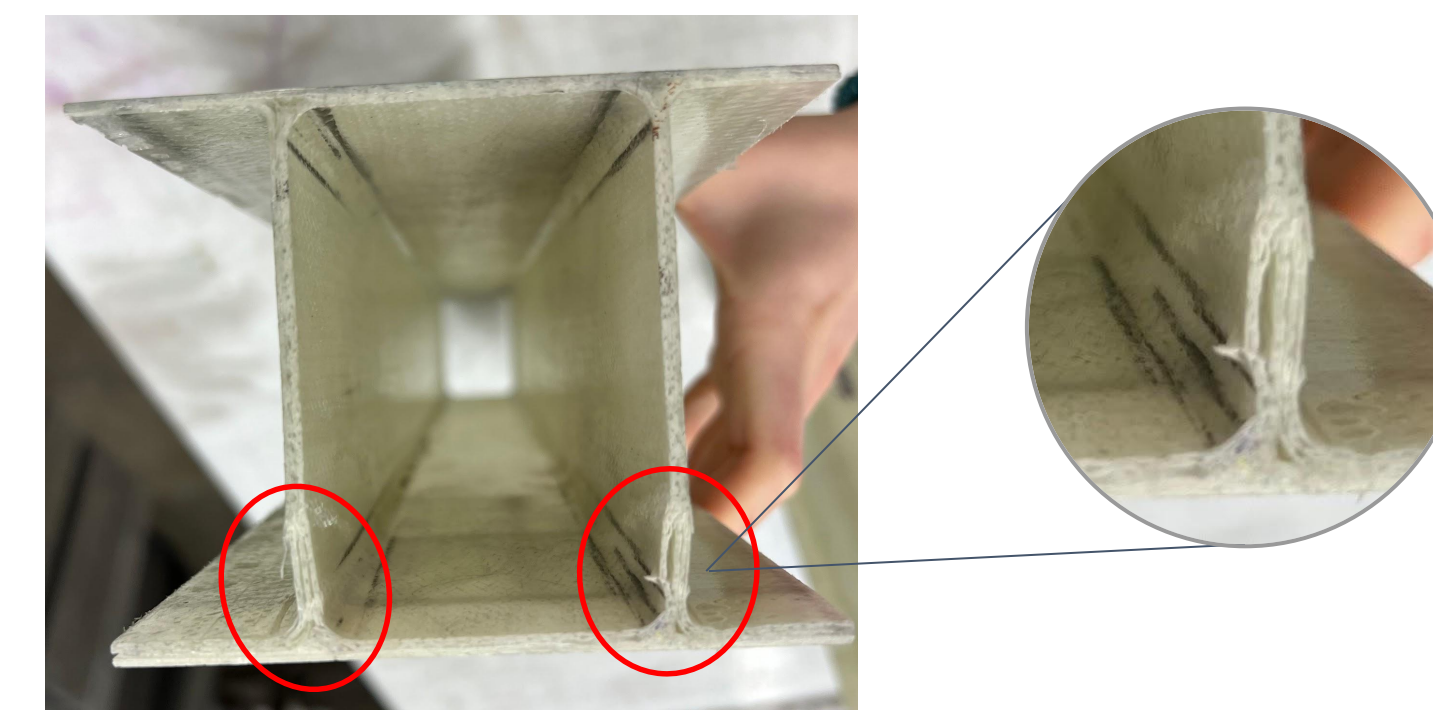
Beam failure points from cross-section view. Close-up view of delamination.
